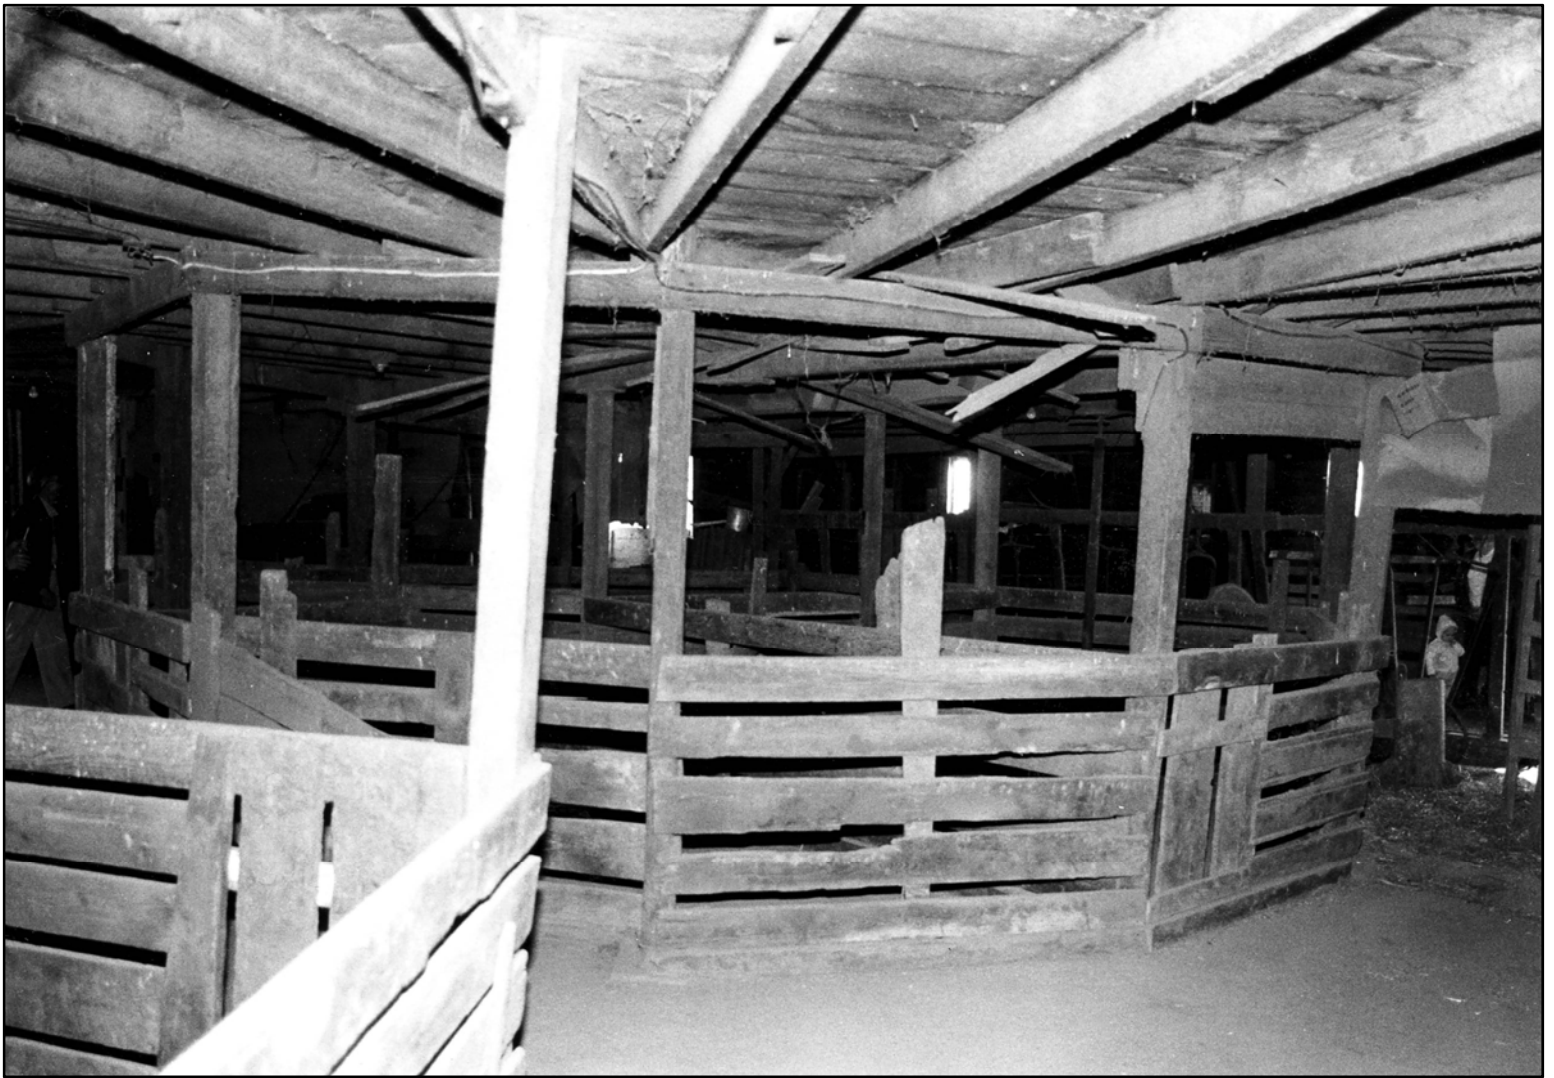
of 6 – interior view looking northeast showing stall arrangement
